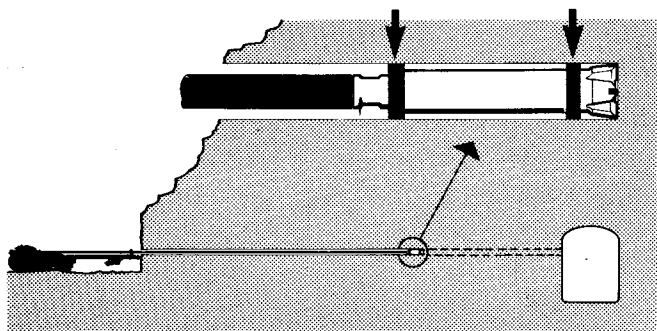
ROC 606 and COP 6 with guides for precision drilling
